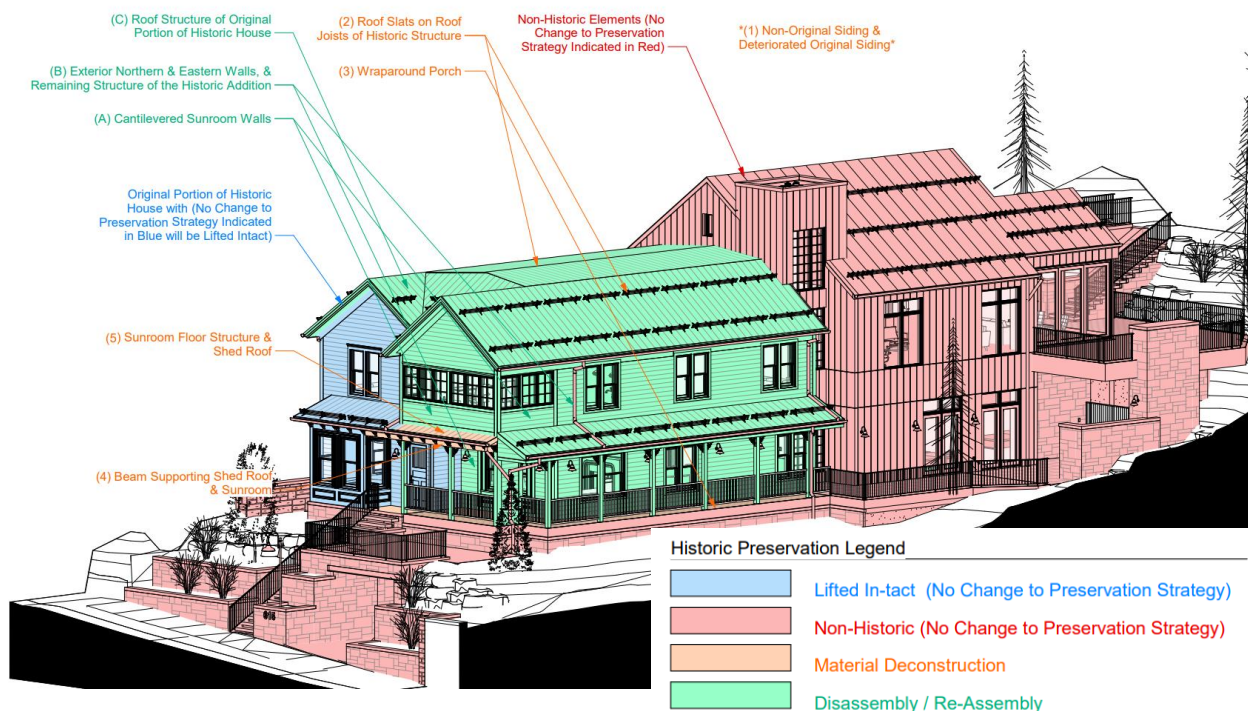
Applicant's proposed panelization plan with items to be panelized highlighted in green.
